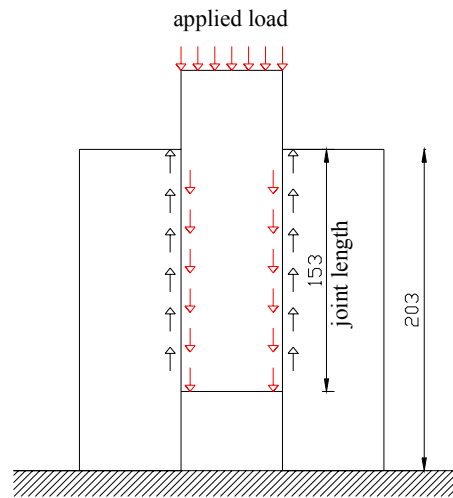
Scheme of bed joint shear test (measure in mm)
